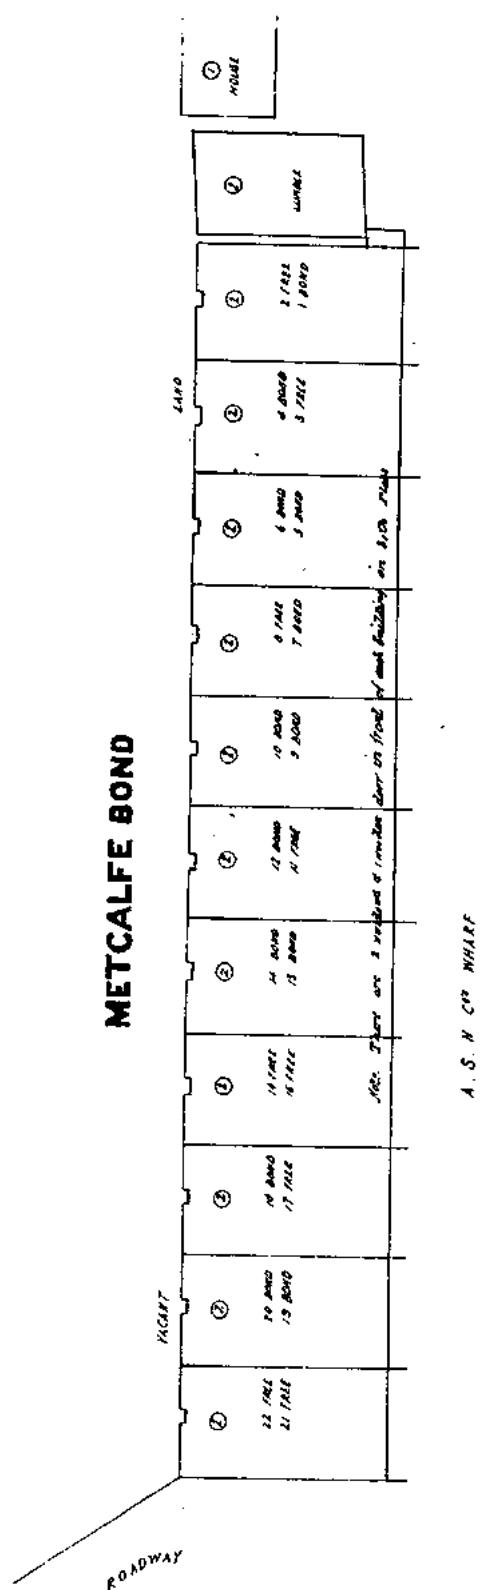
Metcalfe Bond, 1882. HP Dove's plan of 1882 showed the earlier layout of the Stores with two storeys before they were enlarged to three storeys by 1887. (Source: HP Dove, *Plans of Sydney Executed for Insurance Companies*, Sydney, 1882)
